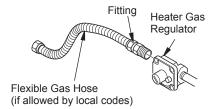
Attaching Flexible Gas Hose to Heater Gas Regulator
